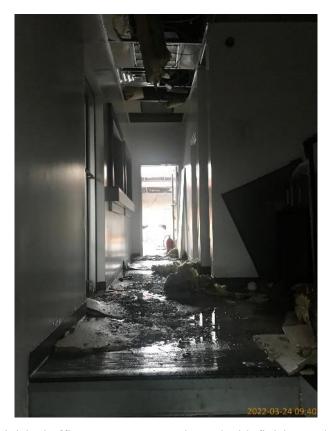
Finished office spaces are waterlogged with finishes and insulation falling to the floor.
